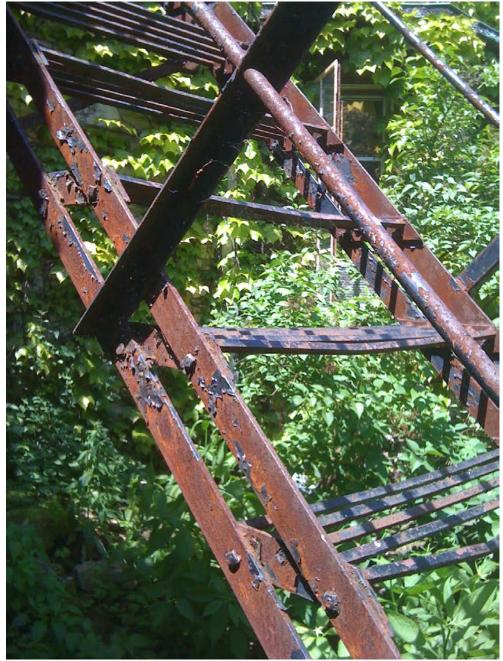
Surface corrosion and tread deterioration on fire escape.
